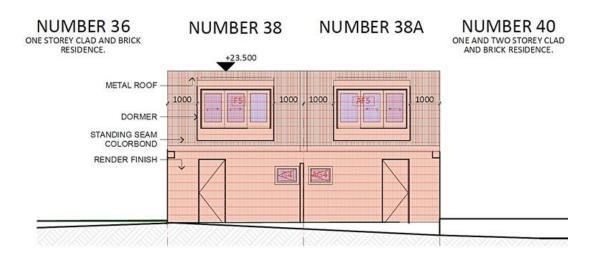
Internal elevation of garage/studio buildings approved at 38 Princess Avenue.
